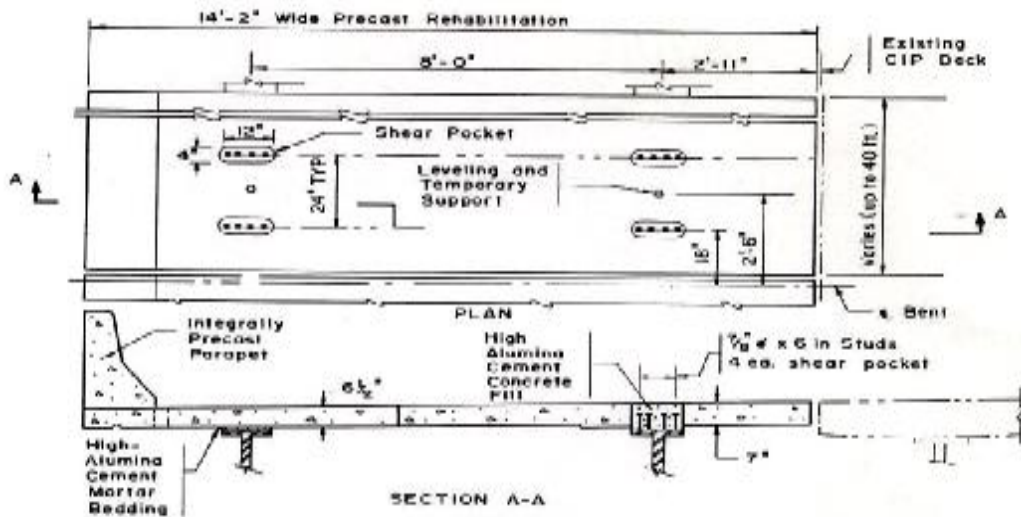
Panel dimensions and cross section of the I-80 Overpass project
